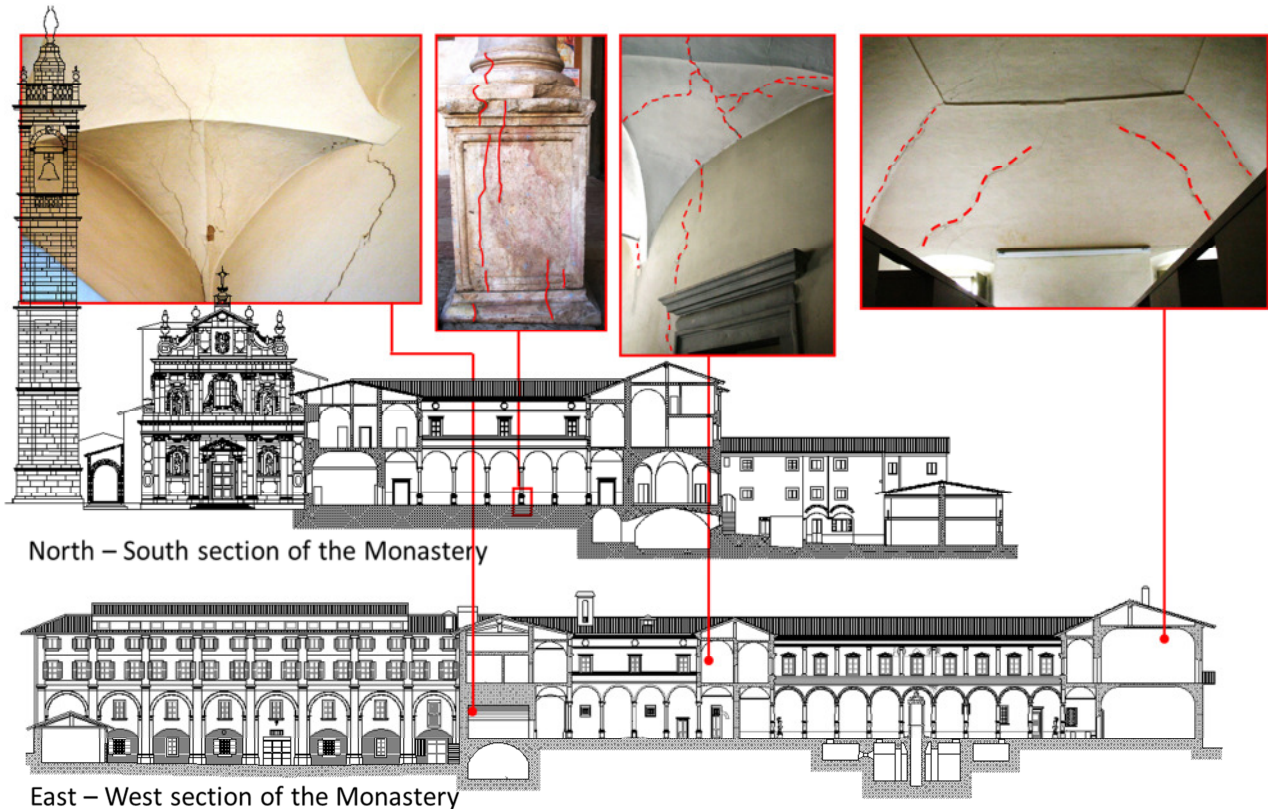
Localization of the main crack pattern in the building (layout by the author).
